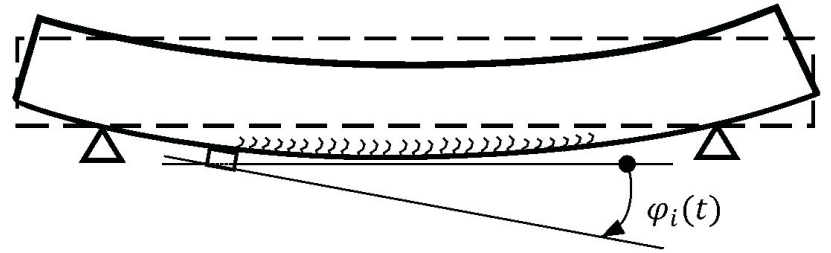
Cracked reinforced-concrete beam in flexural vibrations
